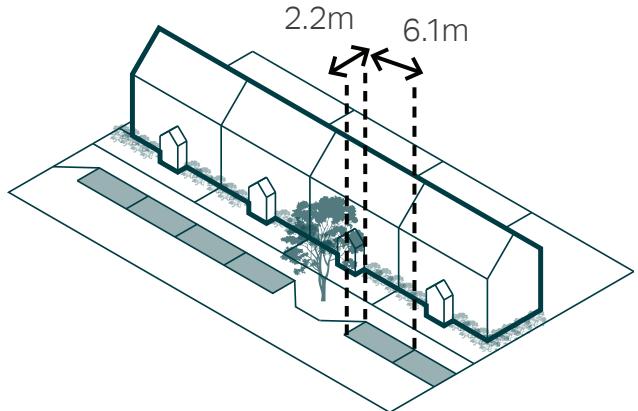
Illustrative diagram showing an indicative layout of on-street parking.
